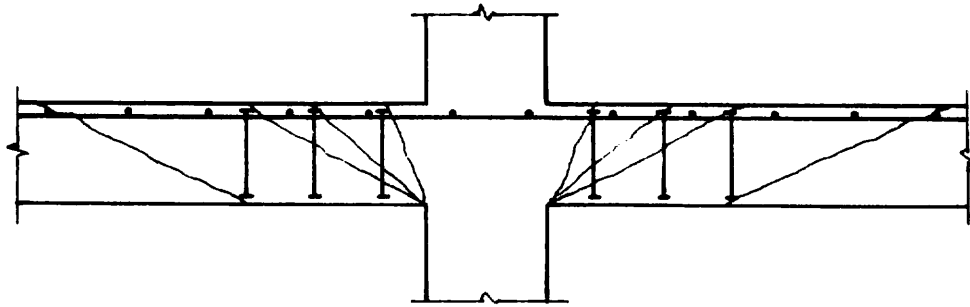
Potential failure surfaces in a slab with shear reinforcement
